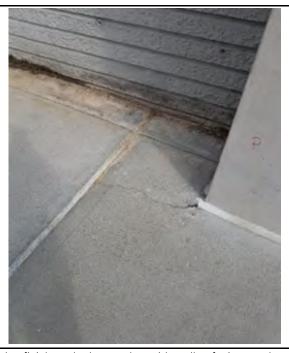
Typical hairline/surficial crack observed on sidewalks, facing northeast. Cracks did not breach to the subsurface. 27 February 2019.
